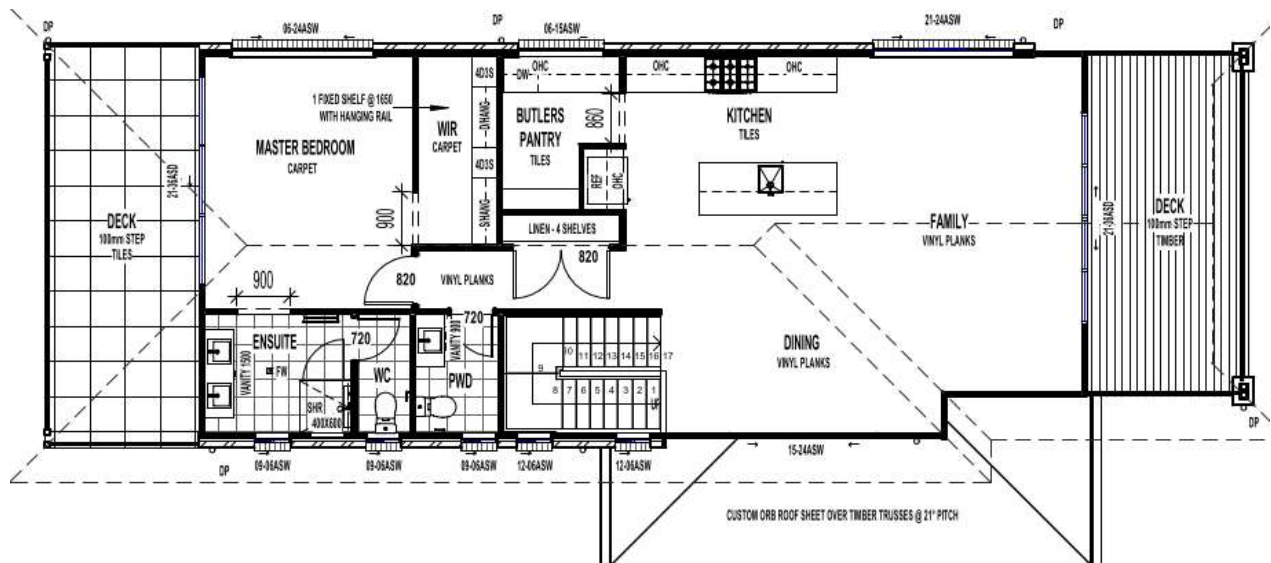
First floor plan of 26 Seaview Street with the rear deck shown in Photo 1.
